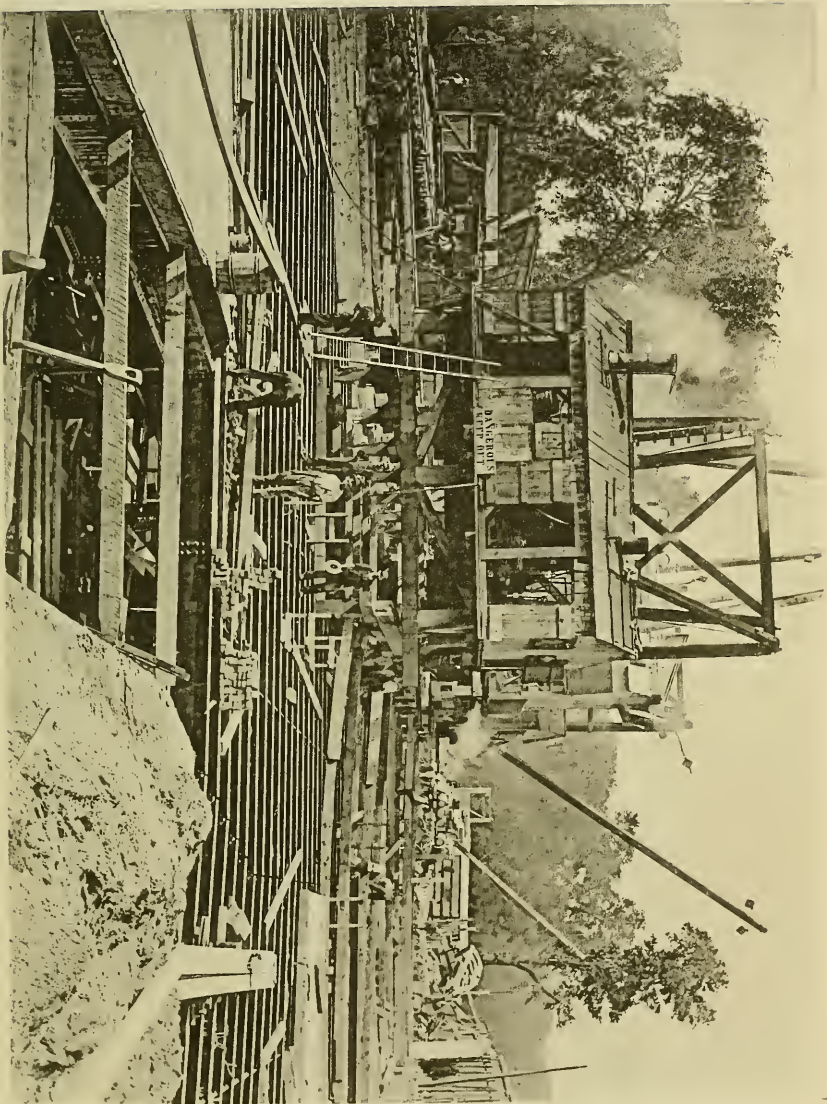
SECTION 2, BOSTON COMMON, TREMONT-STREET MALL. EXCAVATING-MACHINERY AND STEEL ROOF-BEAMS. July 9, 1896.
